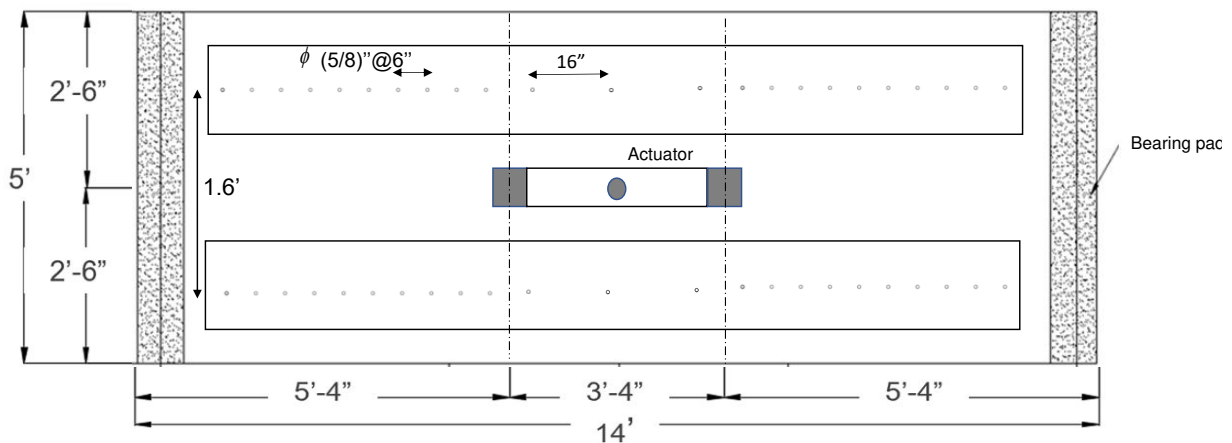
Plan view of the strengthened slab with steel plates test setup.
